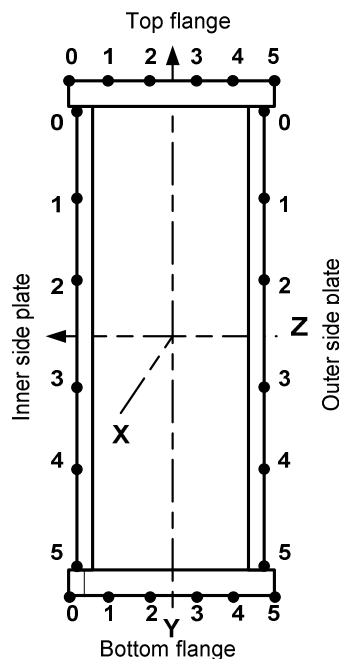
Points on sections C-C, C1-C1, C2-C2 and D-D for the girder near the drive
